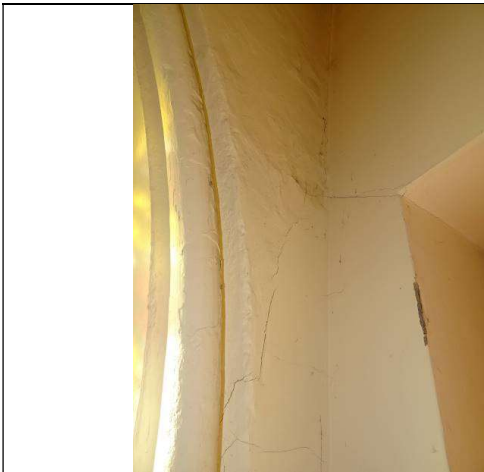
Cracking to early and replacement plasterwork at the stairs.
